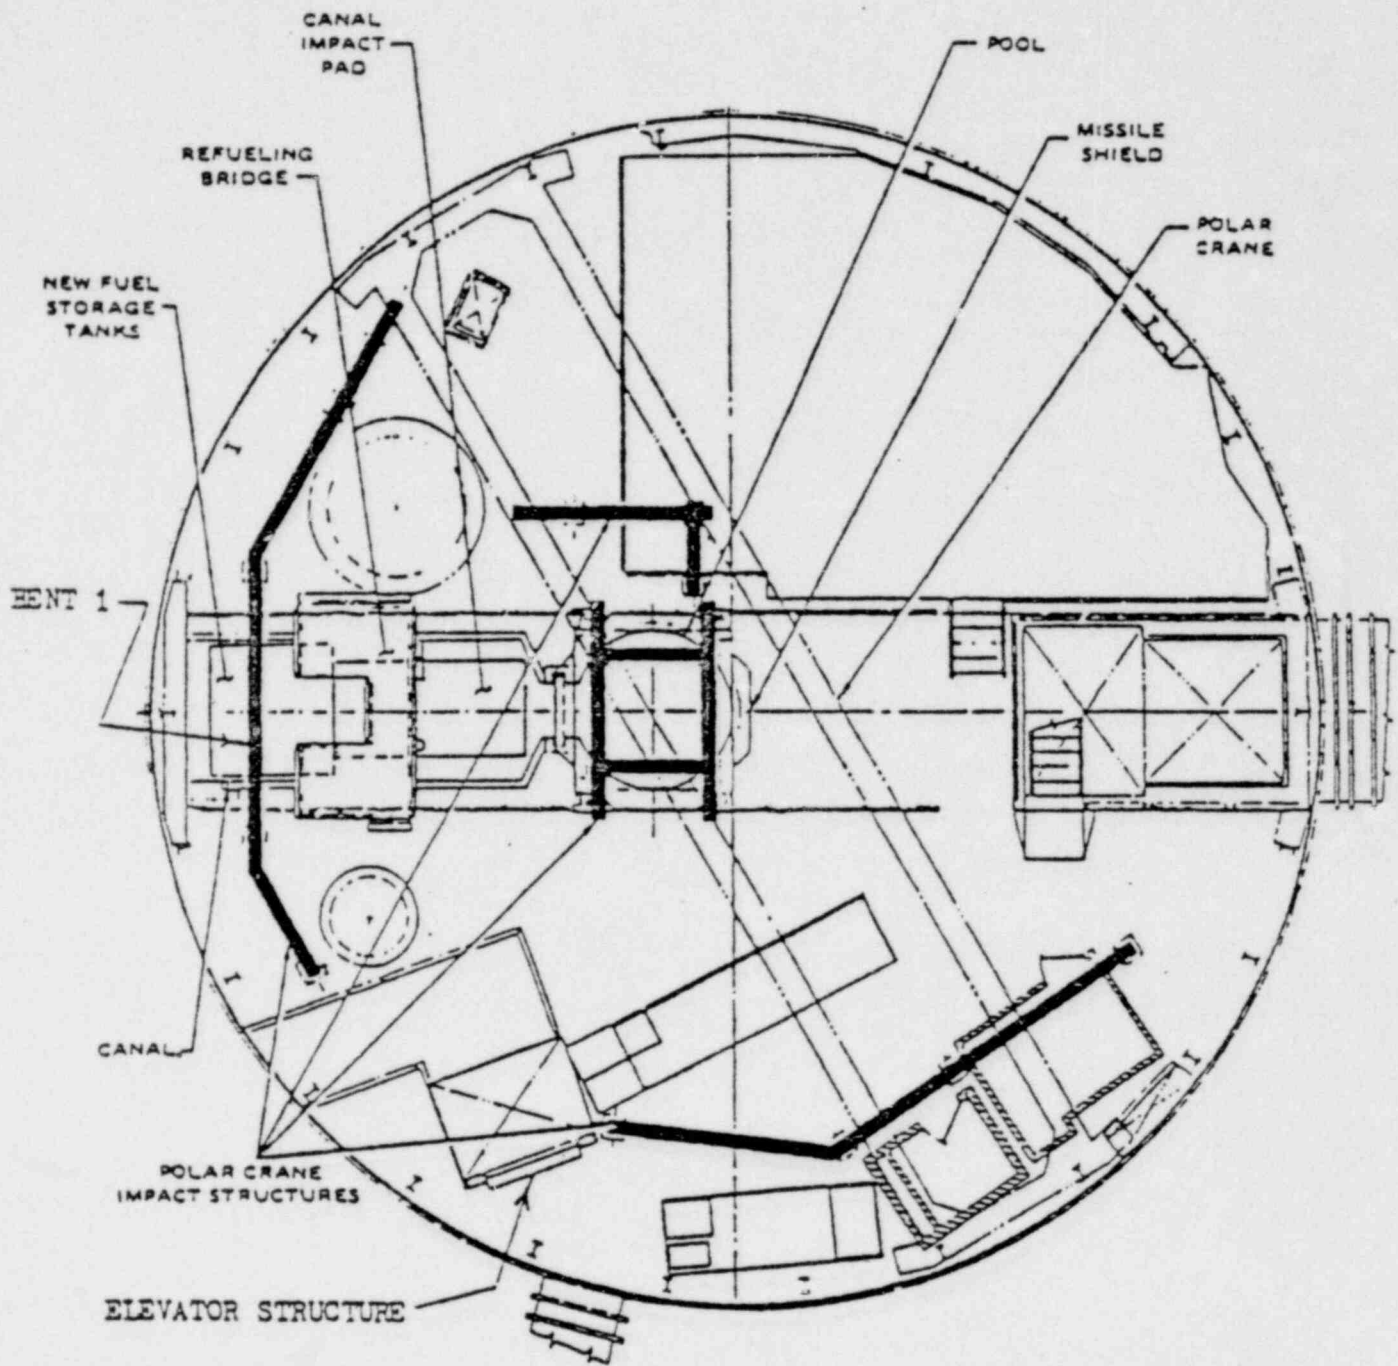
Third Floor Plan of Reactor Building Showing Polar Crane Impact Structure
